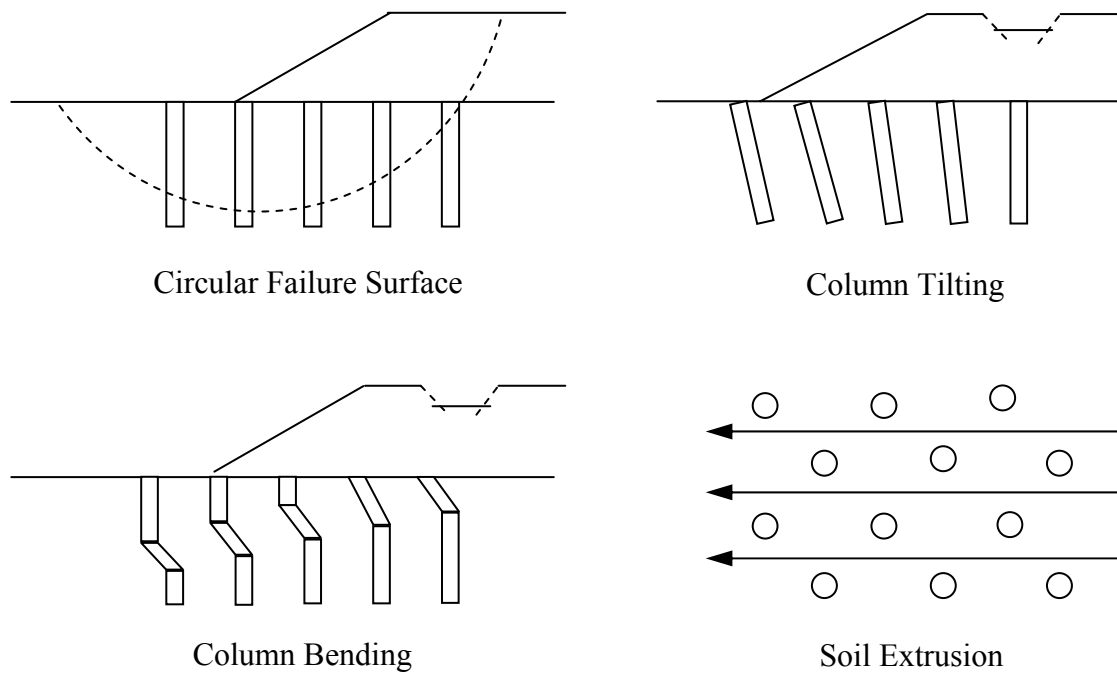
Multiple modes of failure for deep-mixed columns used to support embankments
